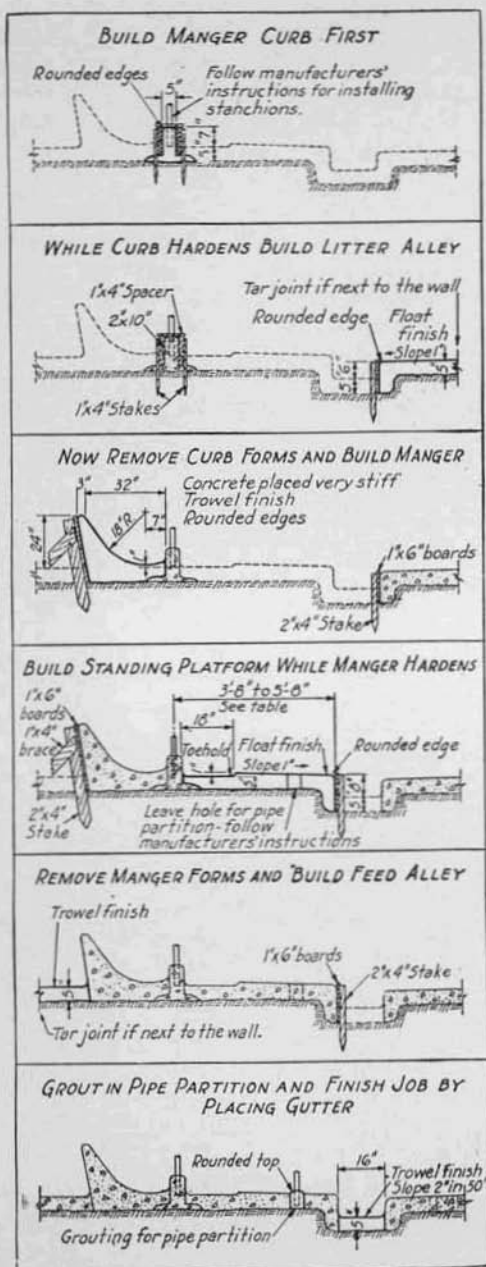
How to build the floor (Cross section shows one half of the floor). (Plan 721-27)
